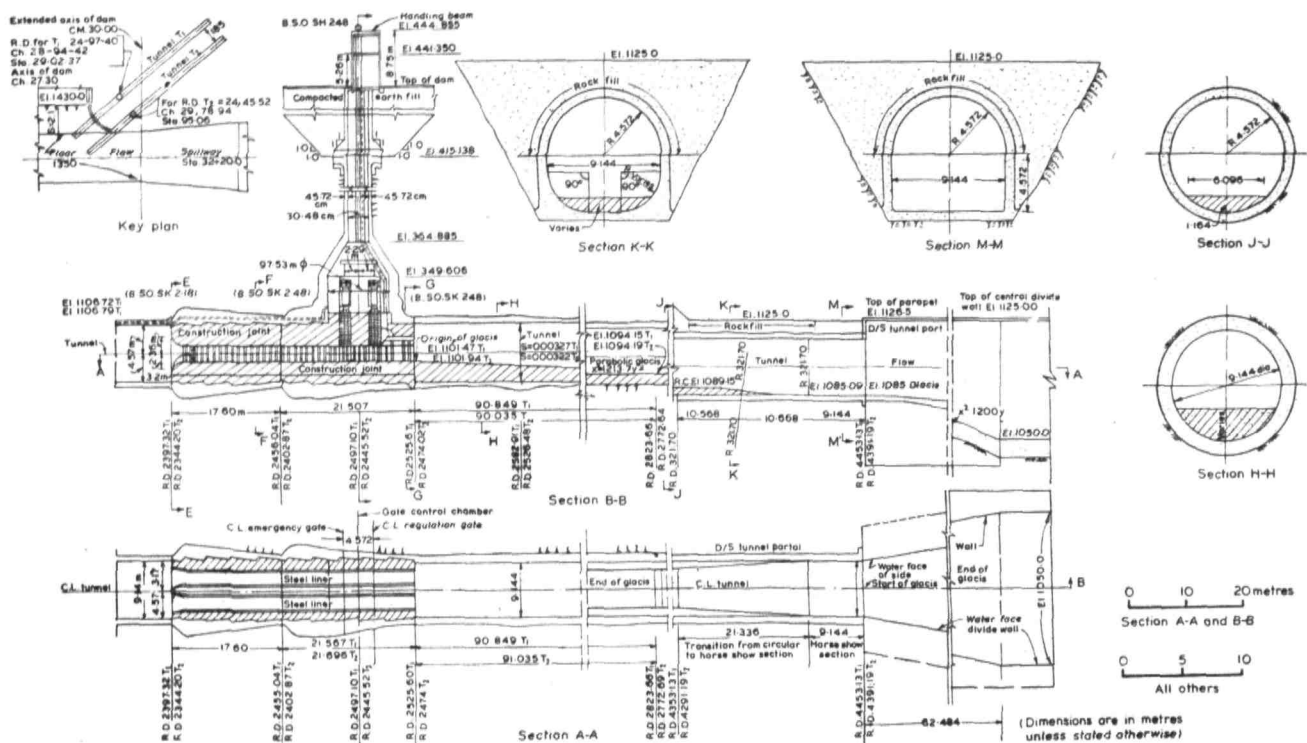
Beas Project Unit II Beas Dam at Pong tunnels T_1 & T_2 outlet works general layout.
